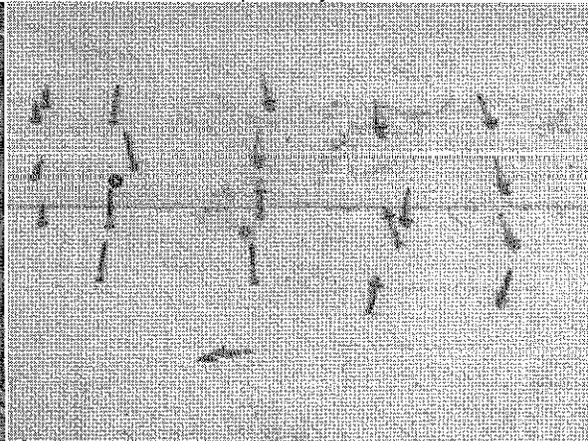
Removed fasteners exhibiting corrosion on threads which have been located in the framed cavity
